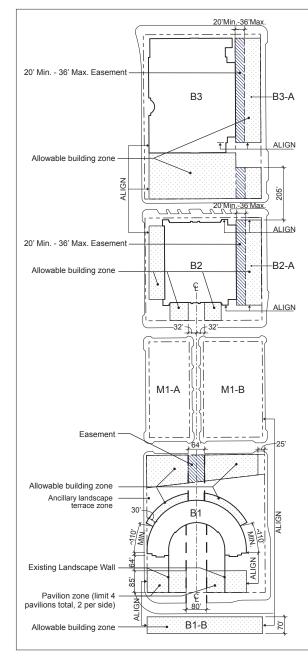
d: B1, M1, B2 and B3 Demonstrative Block Plans
